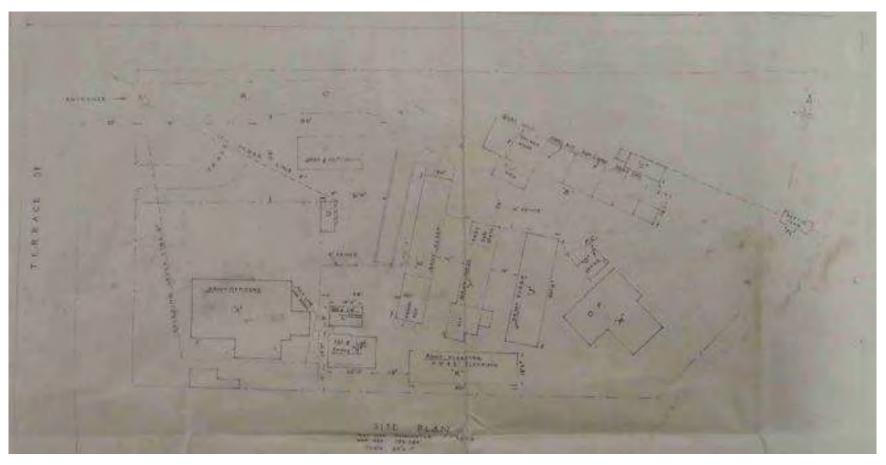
This enlargement of the plan showing the position of the buildings at Shepherds Hill plus new buildings to be erected provides clearer detail of the buildings. (Source: NAA, SP553/1, 125)
